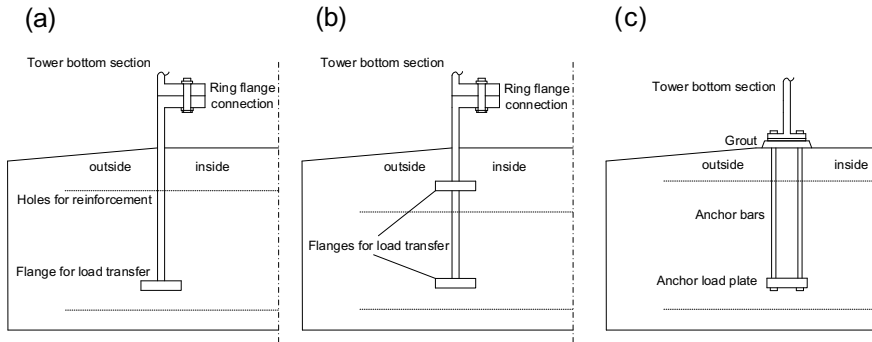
Different transitions between tower and foundation: a embedded ring foundation with one flange for load transfer, b embedded ring foundation with two flanges for load transfer, c anchor cage [WETI]
